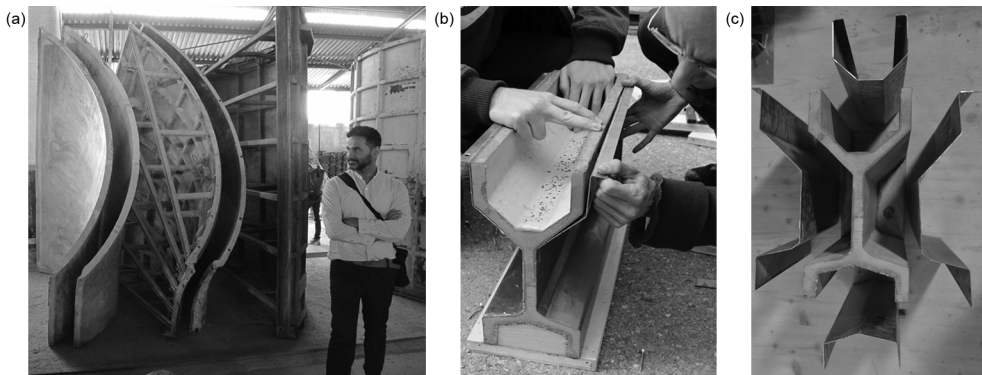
Steel formworking: (a) Brazilian precast plant; (b) X-beam segment; (c) principle.
